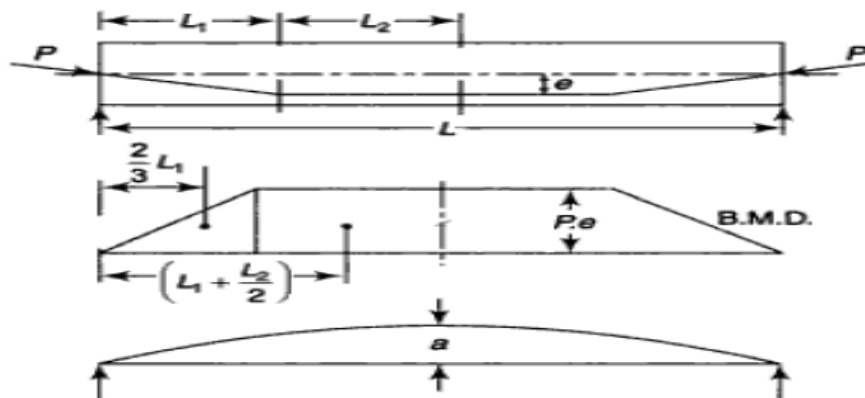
Camber of a beam Trapezoidal or Draped Tendon
